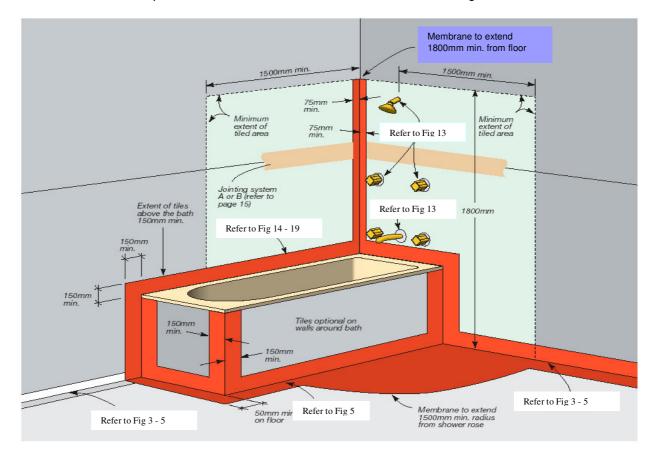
Installation layout for a shower over bath or unenclosed shower area
